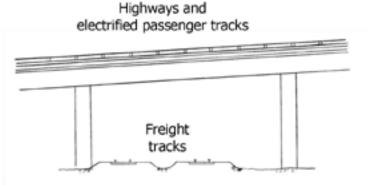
Bridge elevation view with two electrified passenger rail tracks carried on the bridge and two freight rail tracks below the bridge.
